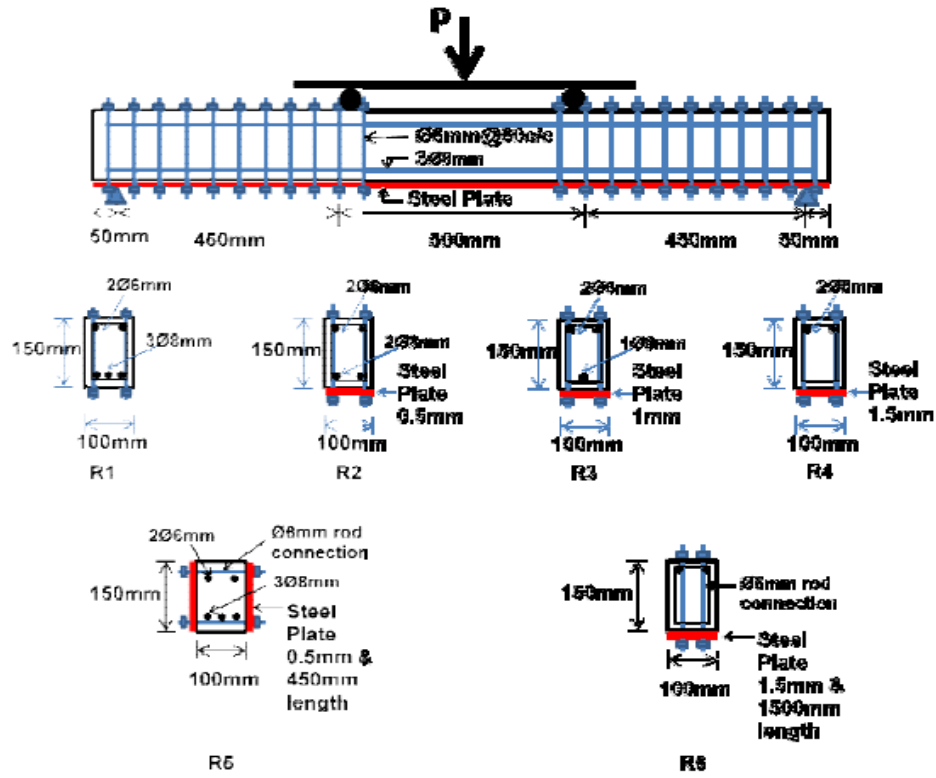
Cross-section of the beam and Stagger row bolt arrangements with steel plate. (P. Oliver Jayaprakash, 6, April 2020)
